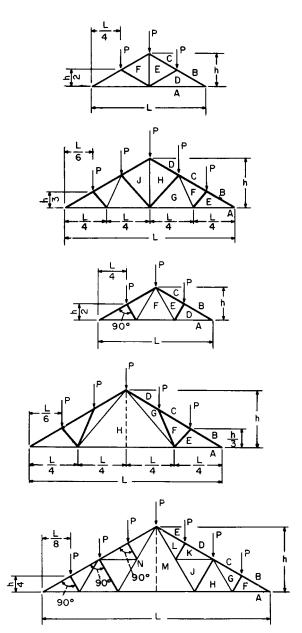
to 12.2.6 Types of steep roof trusses.
